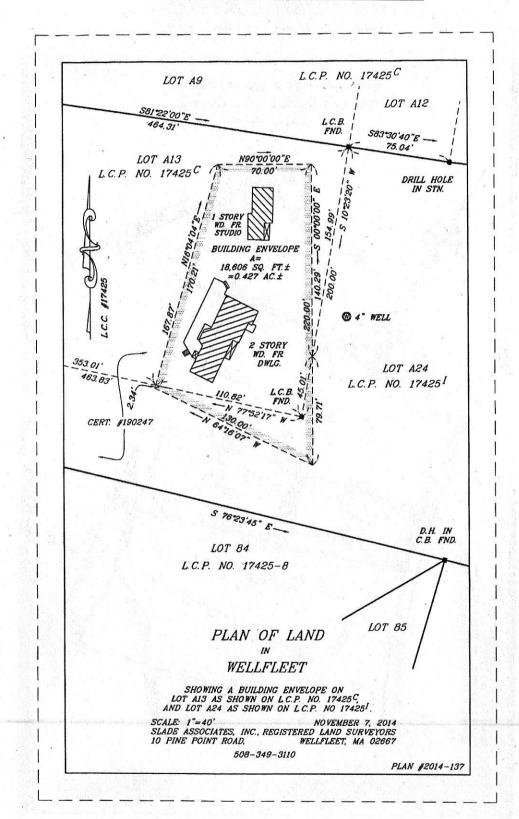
SKETCH OF THE BUILDING ENVELOPE
